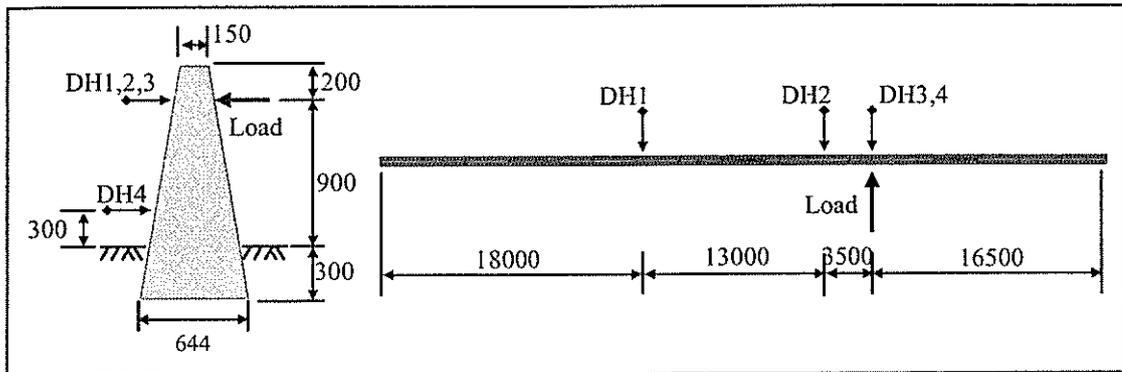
On-site Full-scale Statistic Loading Tests (unit: mm)
